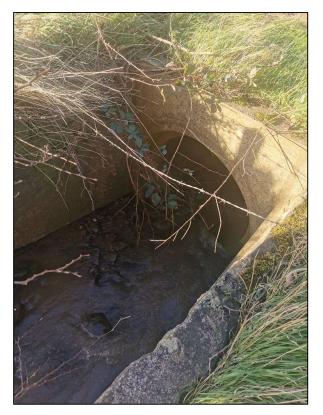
Railway culvert exit (1000mm wide concrete / brick lined arch culvert)
